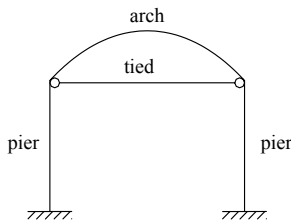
Rigid-frame tied through CFST arch bridge Figure 17 : No.3 Hanjiang Bridge
